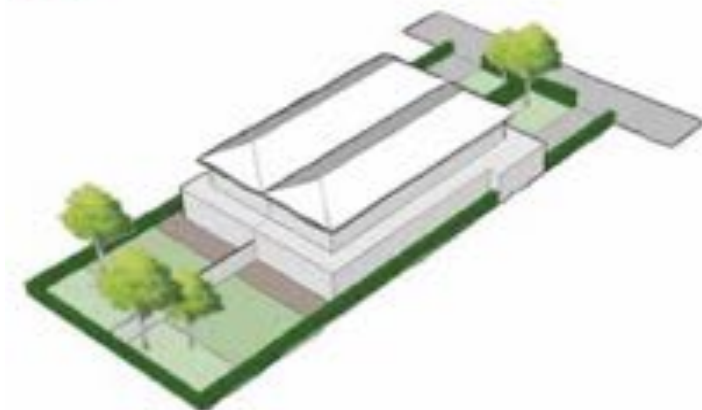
Dual occupancy constructed with the new 35% minimum garden area requirement
